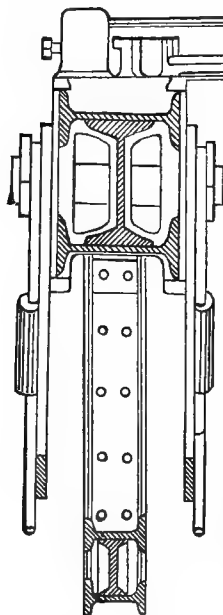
Detail, showing Post, Top Chord, and Wind-brace, built of I-beams.
